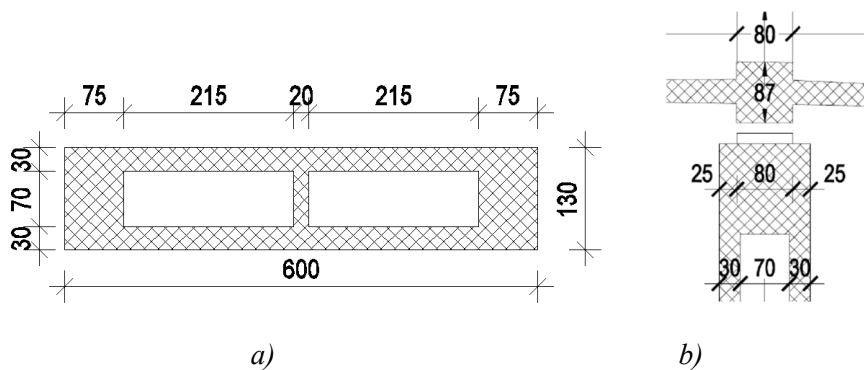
Cross section of a) piers and b) pier with the cap beam
